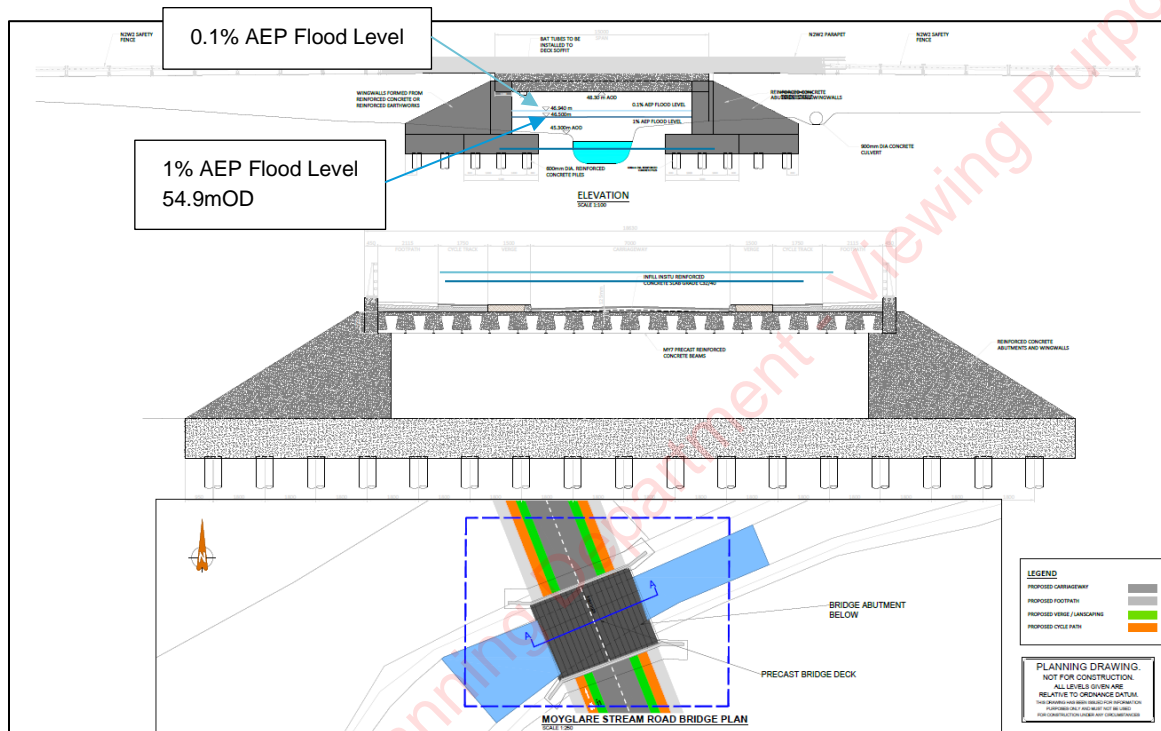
Proposed Bridge Layout- Road Bridge 2
